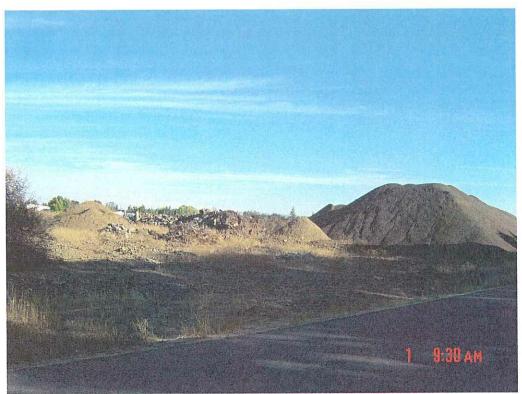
Concrete and asphalt recycling operation on Southgate Avenue, showing stockpiles of material (processed and unprocessed).
